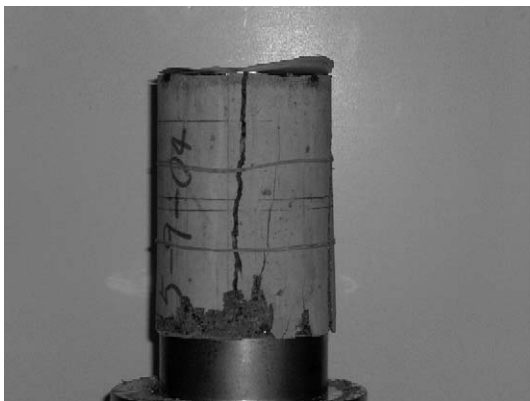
Splitting tensile failure under lubricated loading platen in uniaxial compression.
